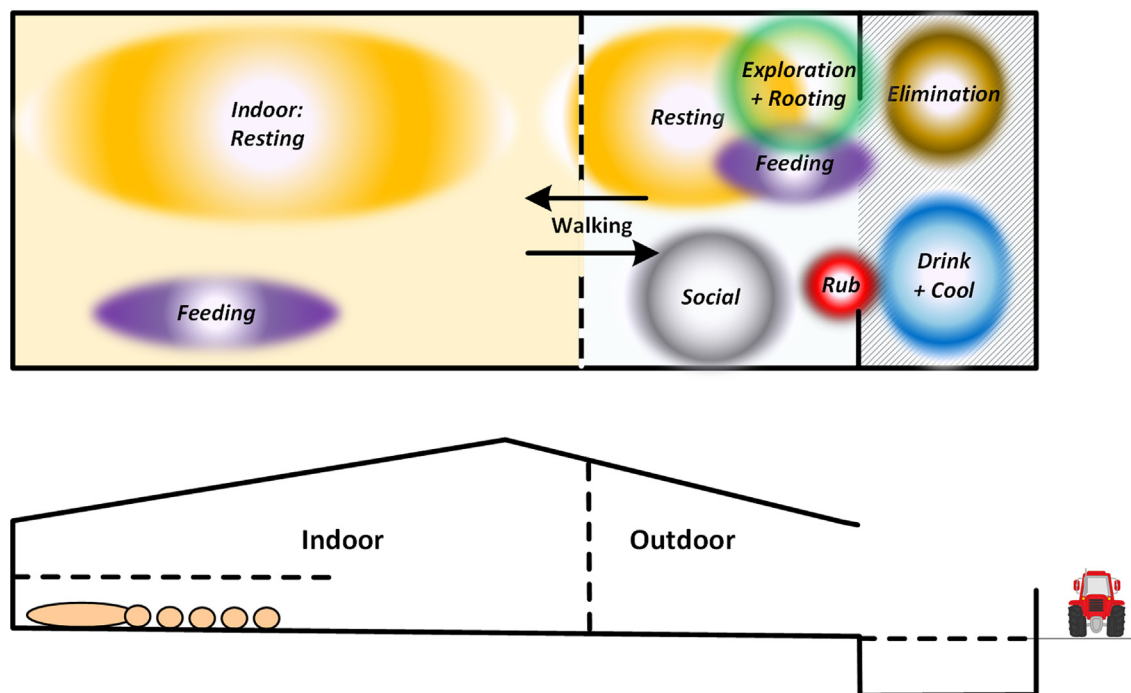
Schematic layout and cross section of a pen with concrete outdoor run (OUTRUN) for growing-finishing pigs considering different functional areas. Indoor: Straw bedded lying area and feeding. OUTFUN (solid floor, roofed): Space for resting during the day, rooting and provision of roughage/feeding, free space for social interaction and locomotion, rubbing/brush close to cooling facility. OUTFUN (slatted floor, unroofed): Elimination area, “wet area” with drinkers and cooling facility.
